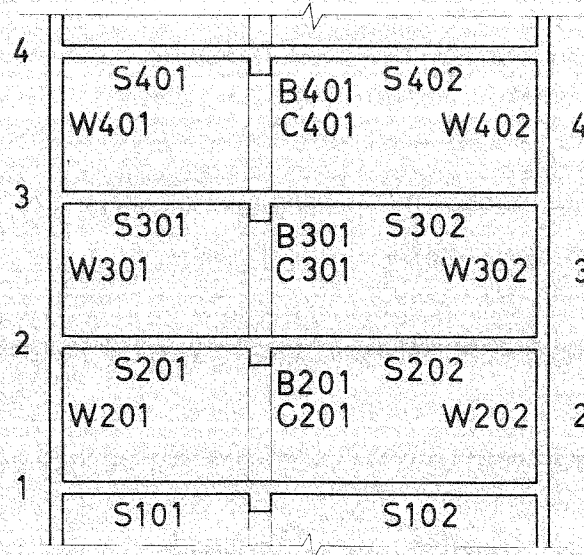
Examples of designation for columns, slabs, walls and beams
